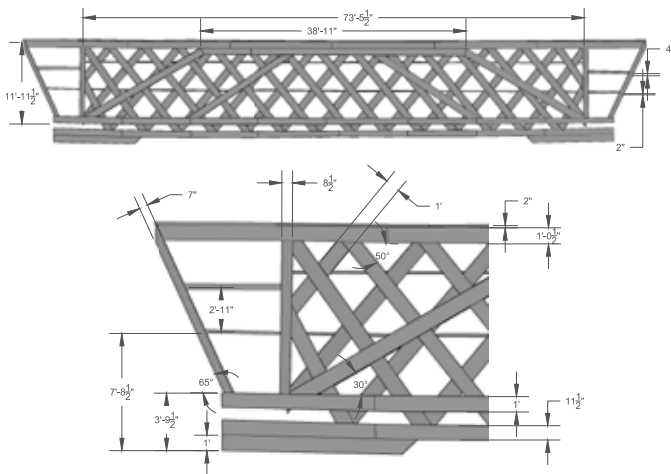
Dimensioned 3D AutoCAD internal side wall image of the Imes Bridge (NRR).
